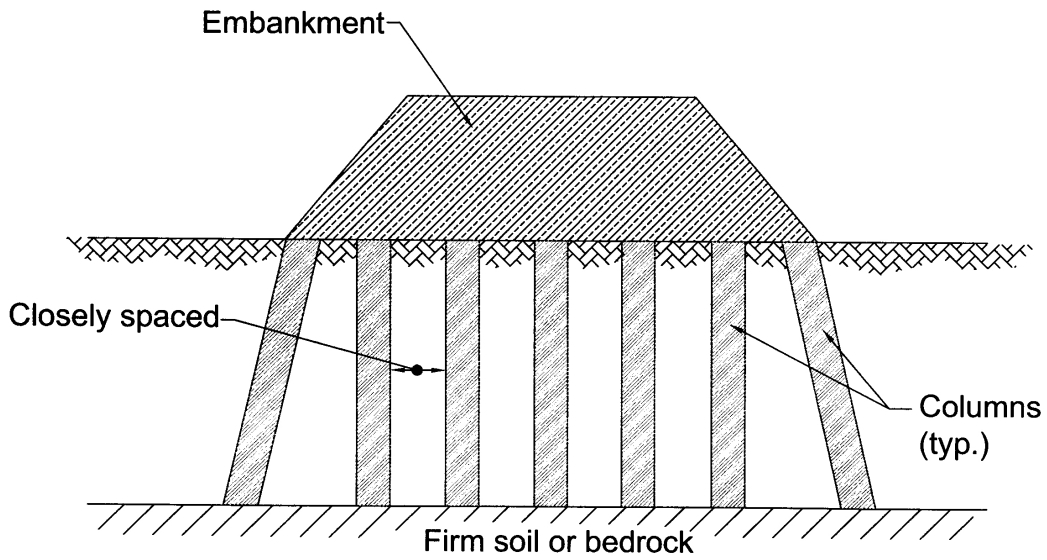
Conventional Column Supported Embankment.⁽¹⁾
